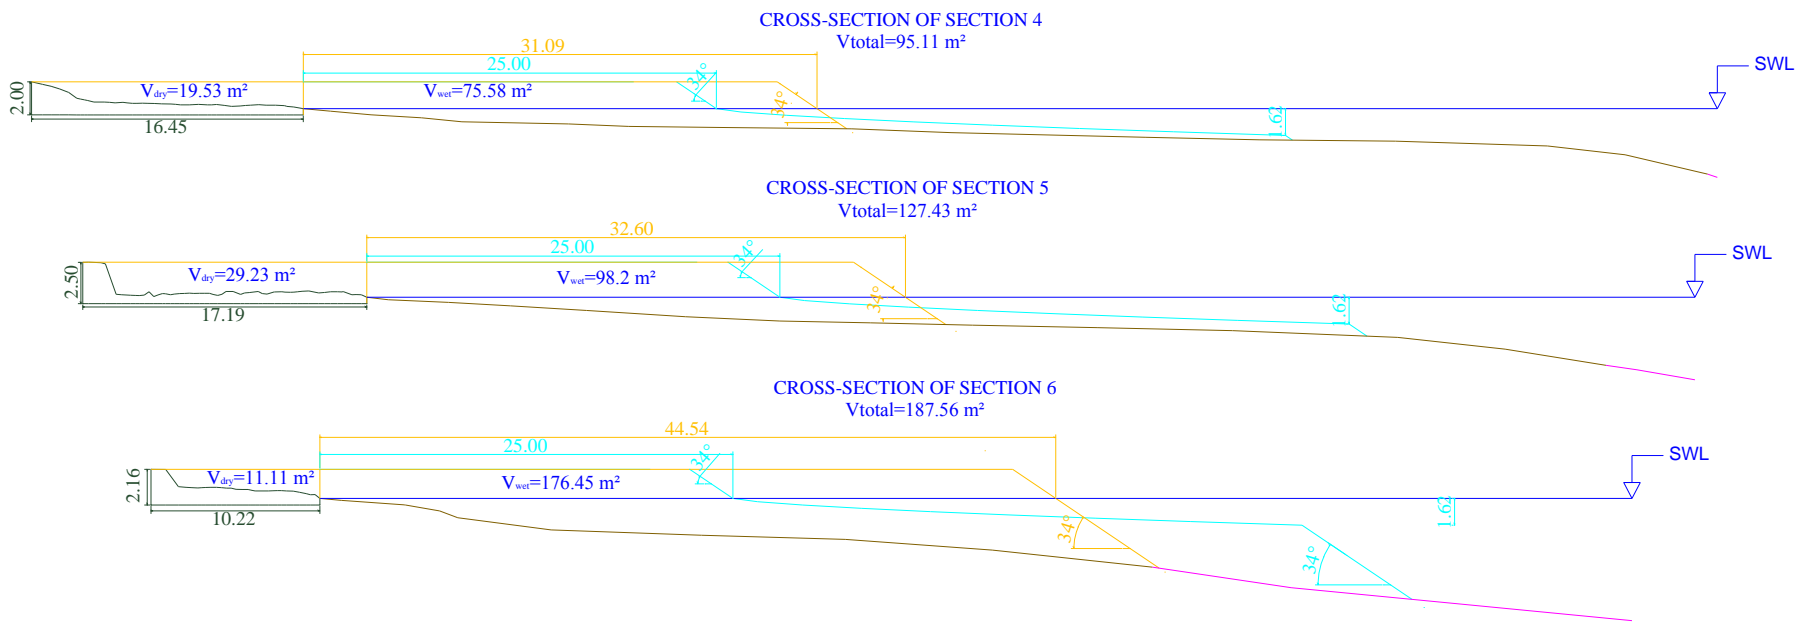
Design profiles of Section 4,5 and 6 for 25 m new dry beach width ($D_{\text{fill}}=0.45 \text{ mm}$).
